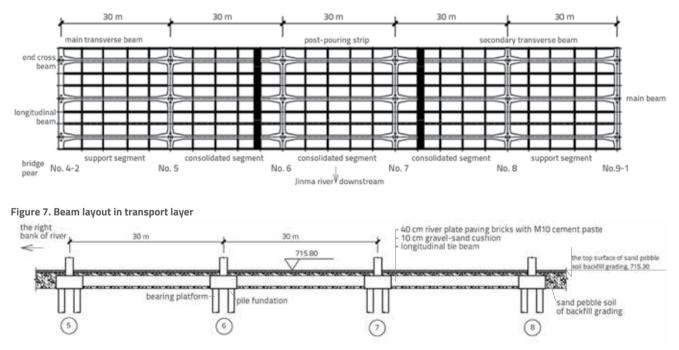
Longitudinal backfill of pier foundation pit (5 to 8)
